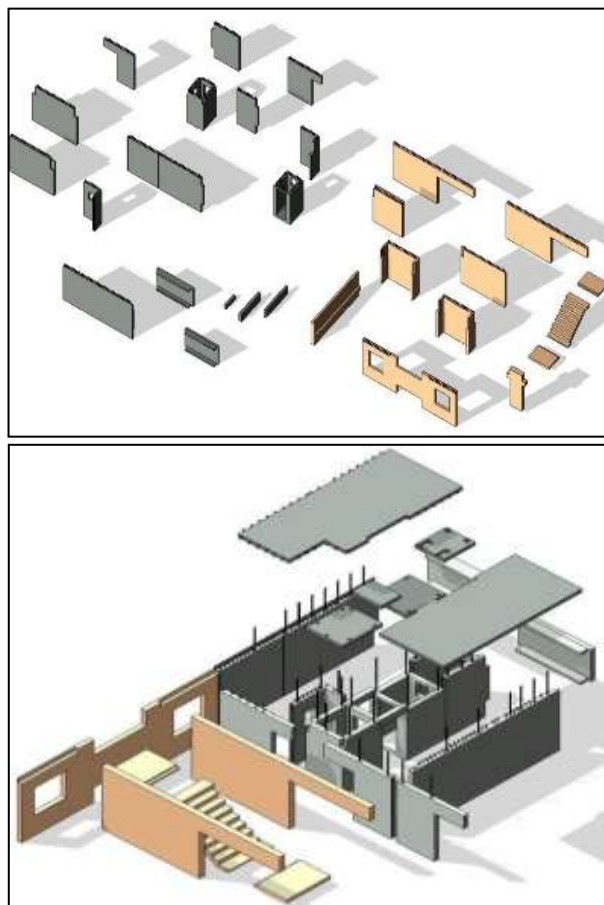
PragatiTowers–TypicalPrecastPanelLayout
